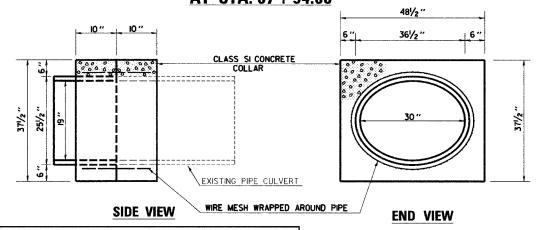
DETAIL OF CONCRETE COLLAR FOR CULVERT EXTENSION AT STA. 67 + 94.68
